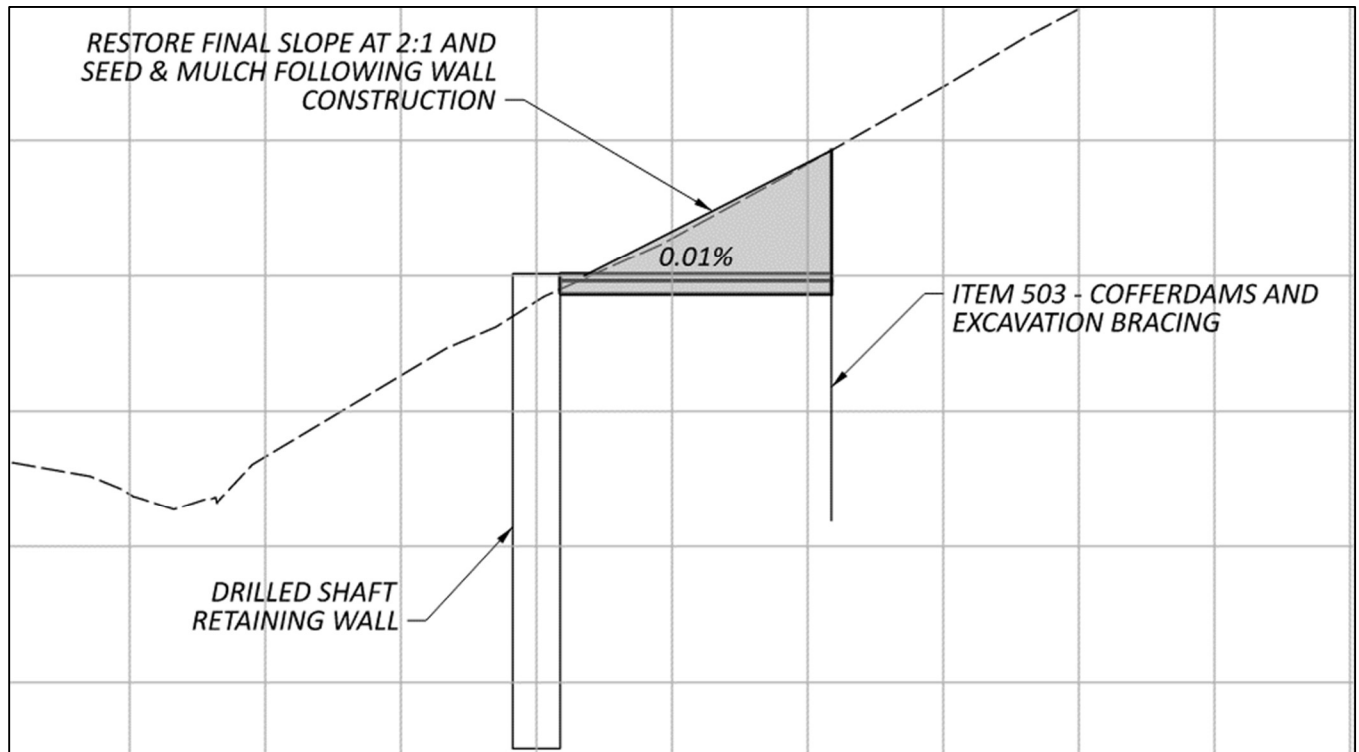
Cross Section of Drilled Shaft Wall at Station 31+00
